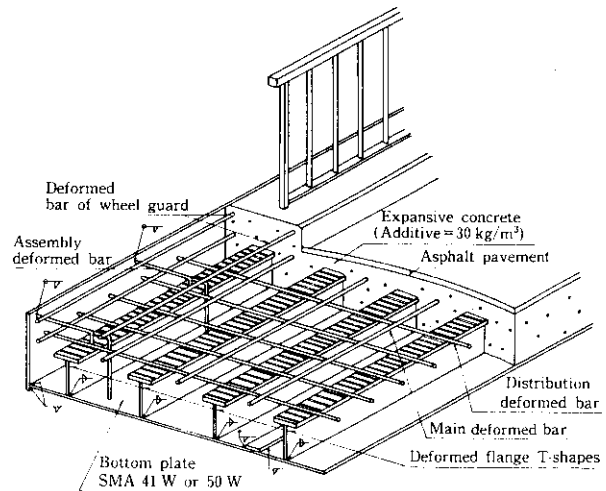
Schema of composite slab bridge using deformed flange T-shapes
